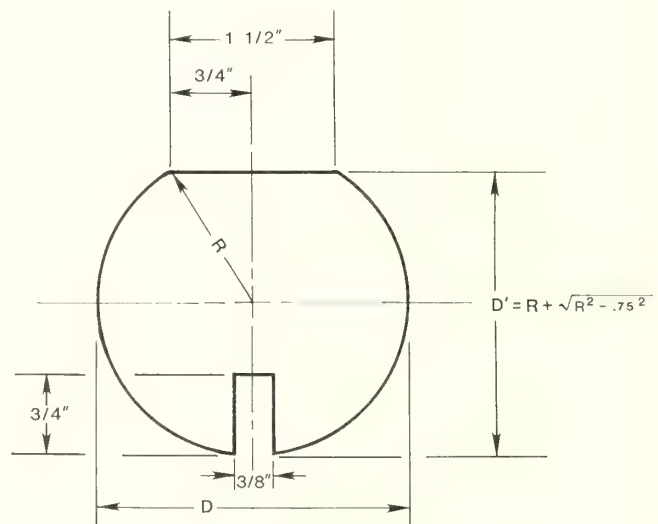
Diagram of dowel flanges for joists 9.5 and 11.875 inches deep in exploratory tests of joists given 2-point loading over a 24-foot span.
